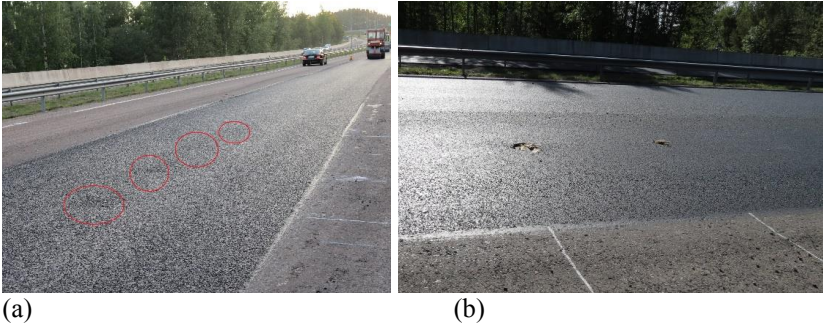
a) Location of the wooden pates is clearly visible. b) Pavement was deteriorated by traffic loading on locations for slabs 2 and 3 and they were already damaged.
